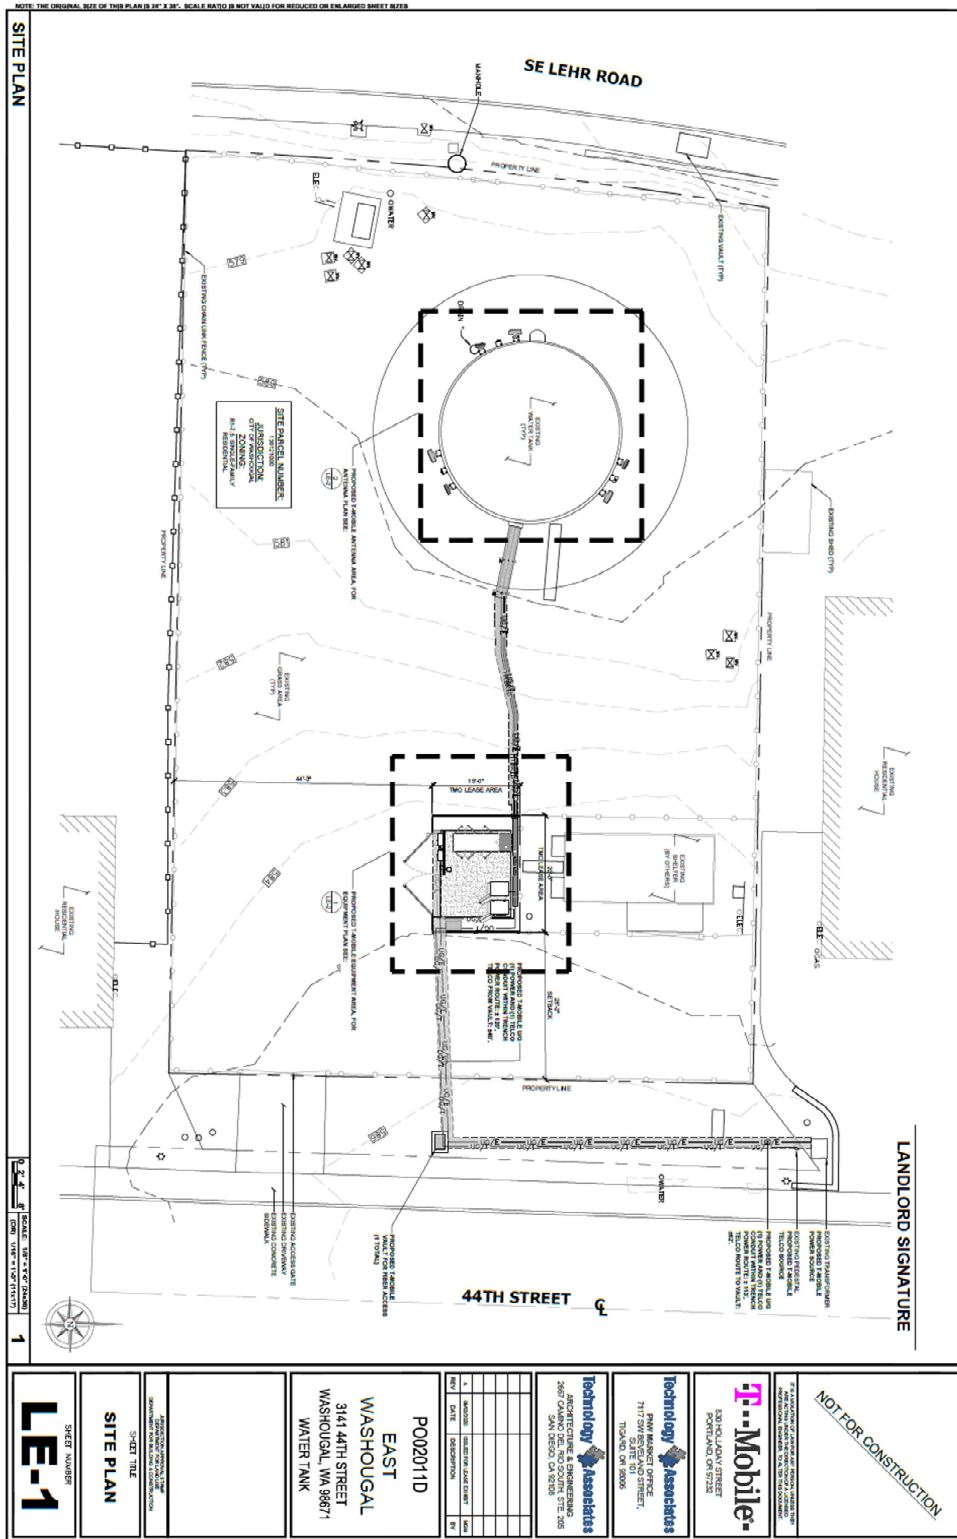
of 3) Site Plan & Final Equipment Inventory
